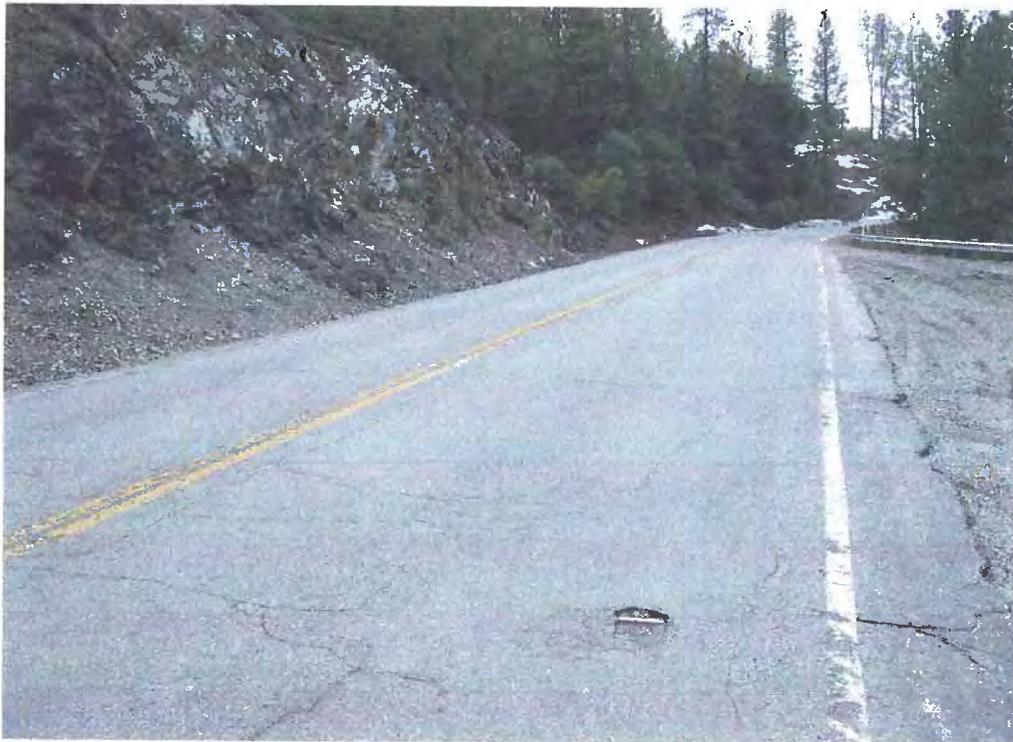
MP 1.55-1.58 - Roadway constricted by bedrock outcrops on west and steep drop off on east (looking north).
